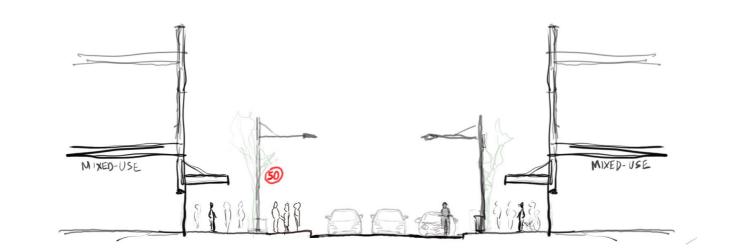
Street section sketch showing the 'Widened footpath' scenario.
